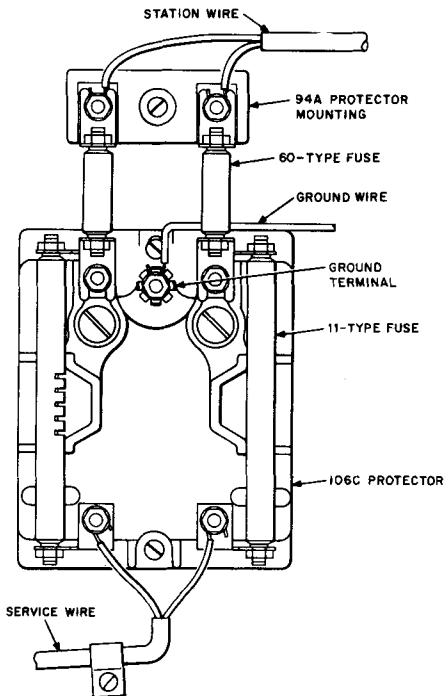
60-Type Fuses Used With 94A Protector Mounting and 106C Protector
